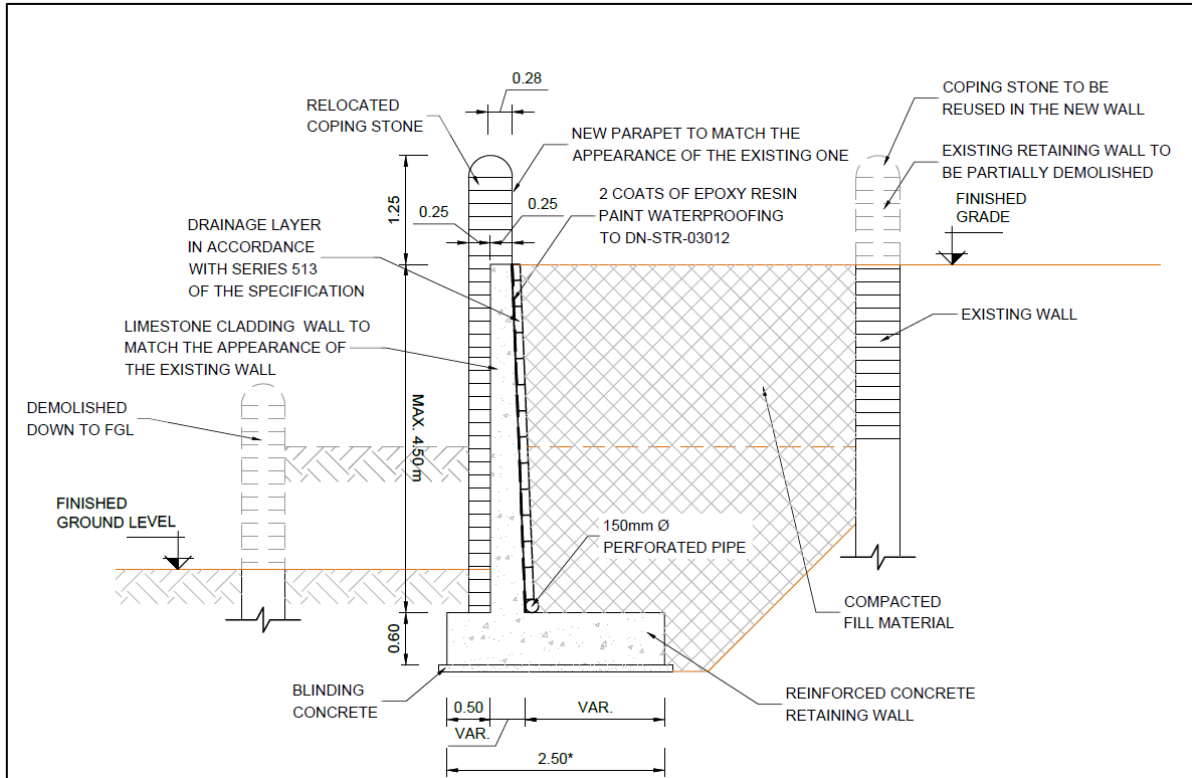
Proposed Retaining Wall at Clanbrassil Street Upper southern section
